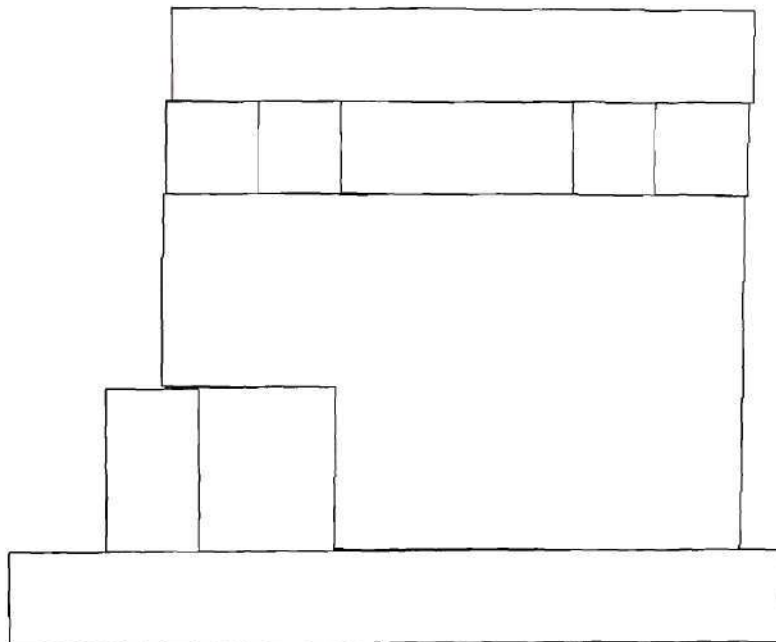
Deformed shape of Wall1 (loaded to the right)
